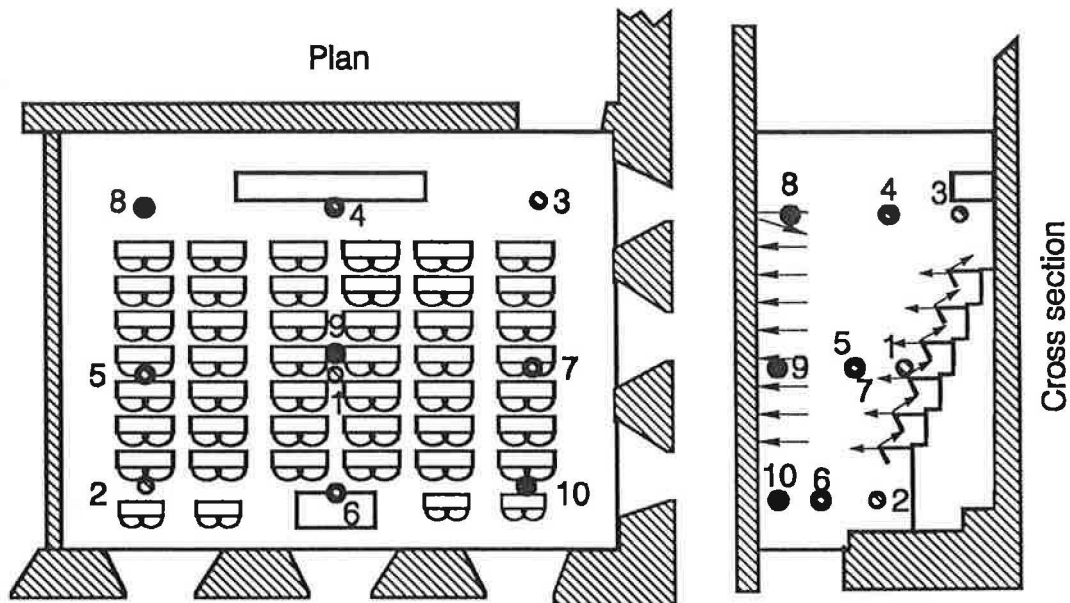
Plan and elevation of the auditorium, together with the locations of measurement. Arrows in the cross section show the air inlet and outlets.
